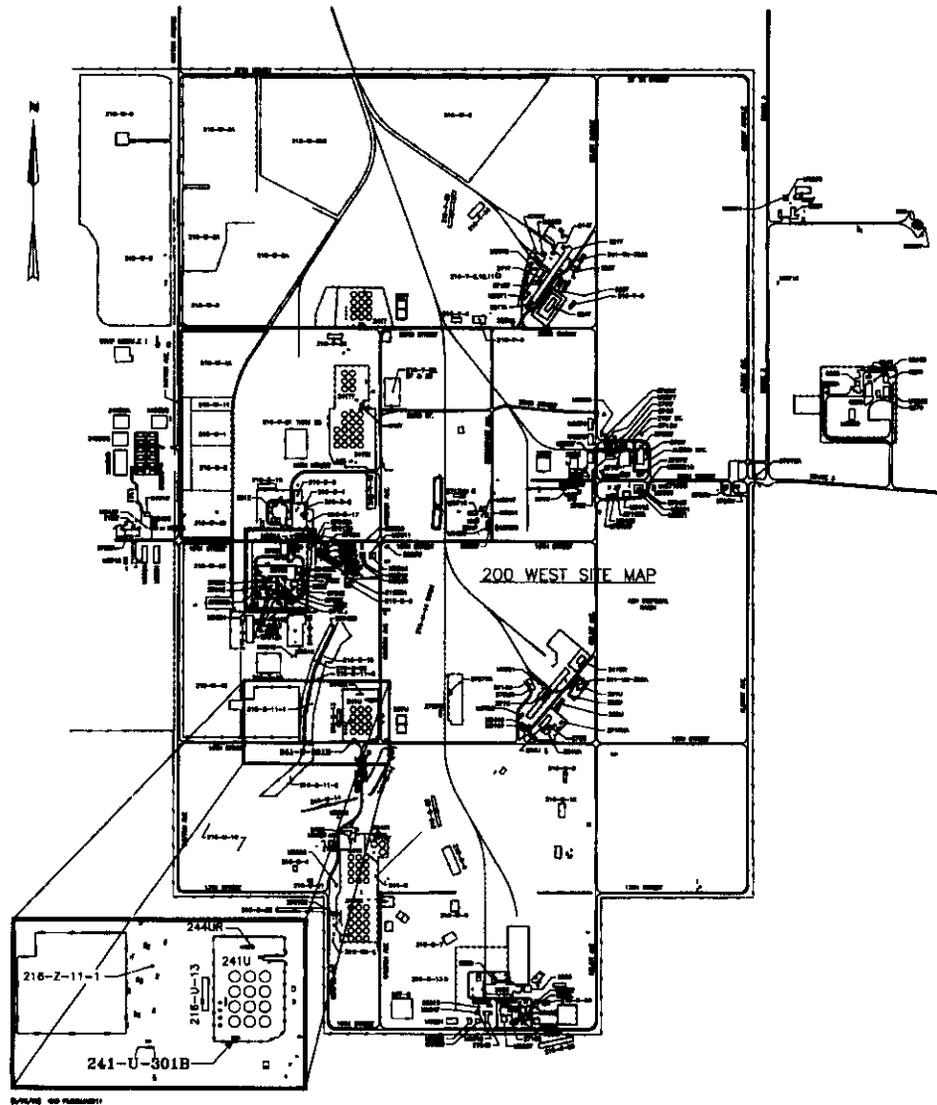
SITE PLAN - 241-U-301B Catch Tank
